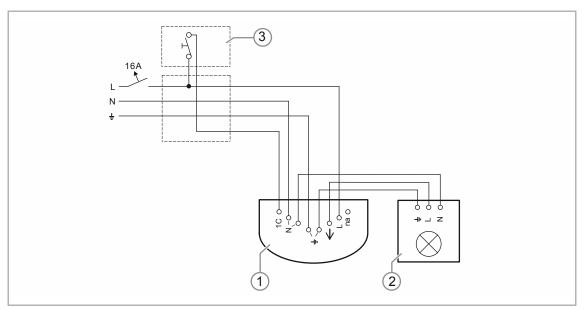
Examples of switch: light control with extension unit and moisture-protected device at a private house
